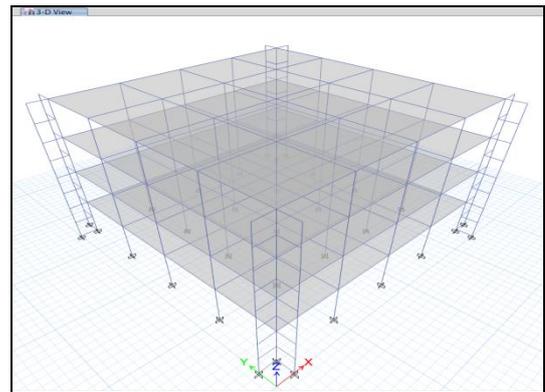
4 Storey RC Building with CFST LCF (4RC_CFLCF)
